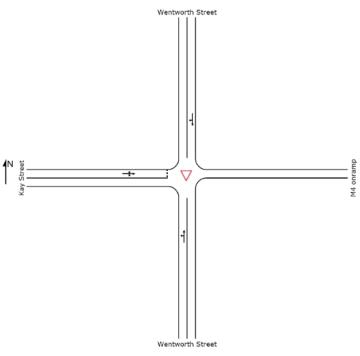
Proposed intersection of Wentworth Street/Kay Street
